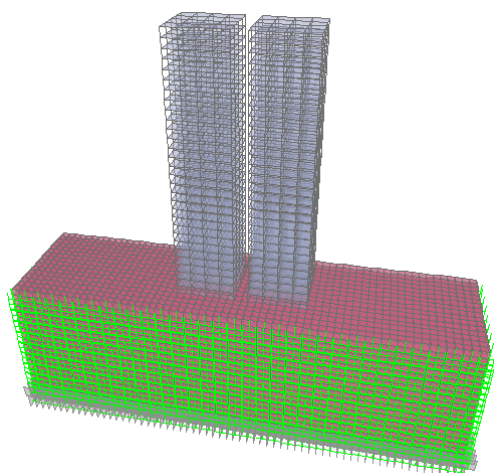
A typical 3D FE model of two adjacent 30-story buildings on pile groups on Site 2
